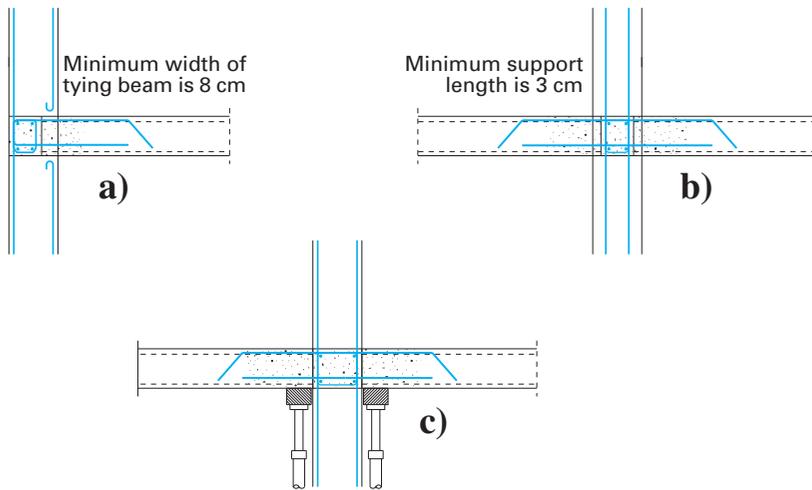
The connection between hollow core floor and reinforced concrete parting wall.
